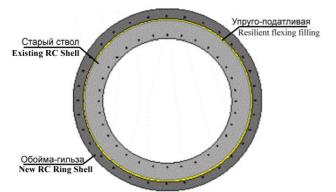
Scheme of Shoring the Chimney Reinforced Concrete Stem with a Ring-shell.
